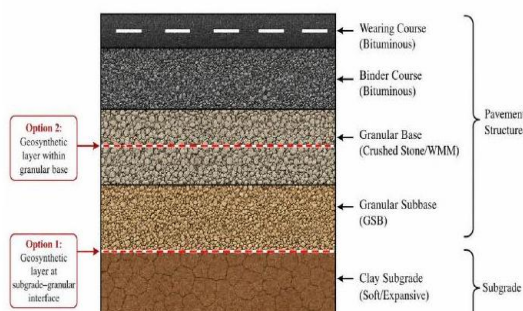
Typical flexible pavement cross-section showing the position of a geosynthetic reinforcement layer relative to the clay subgrade
